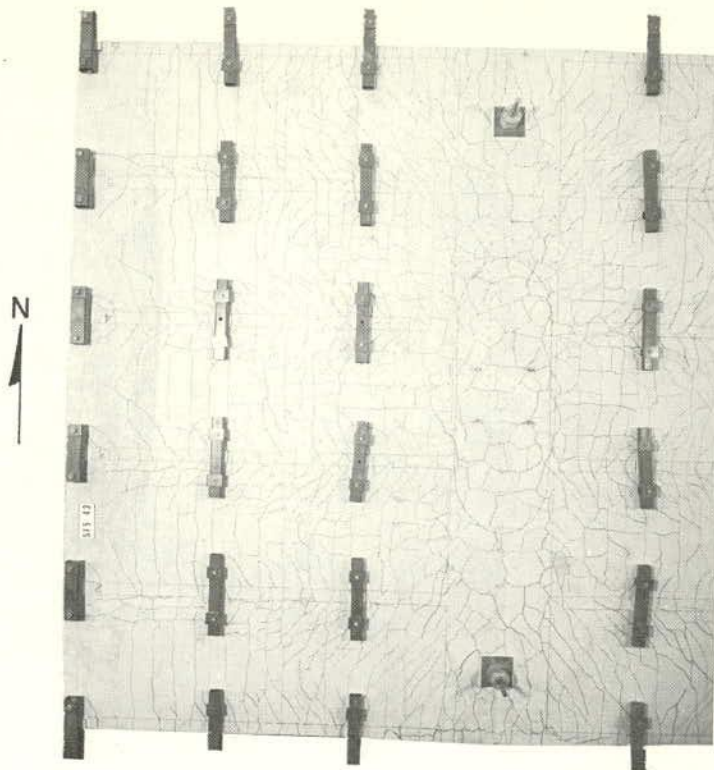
Deck Cracking of Specimen SF-5 at End of Test
